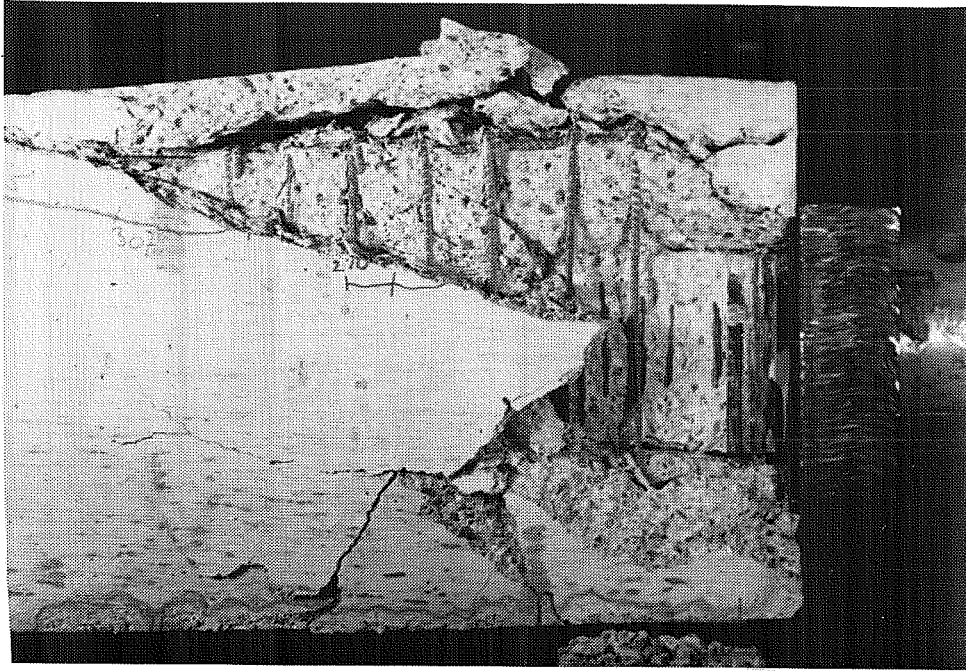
Spalling of Concrete Cover (Specimen Beam1)
